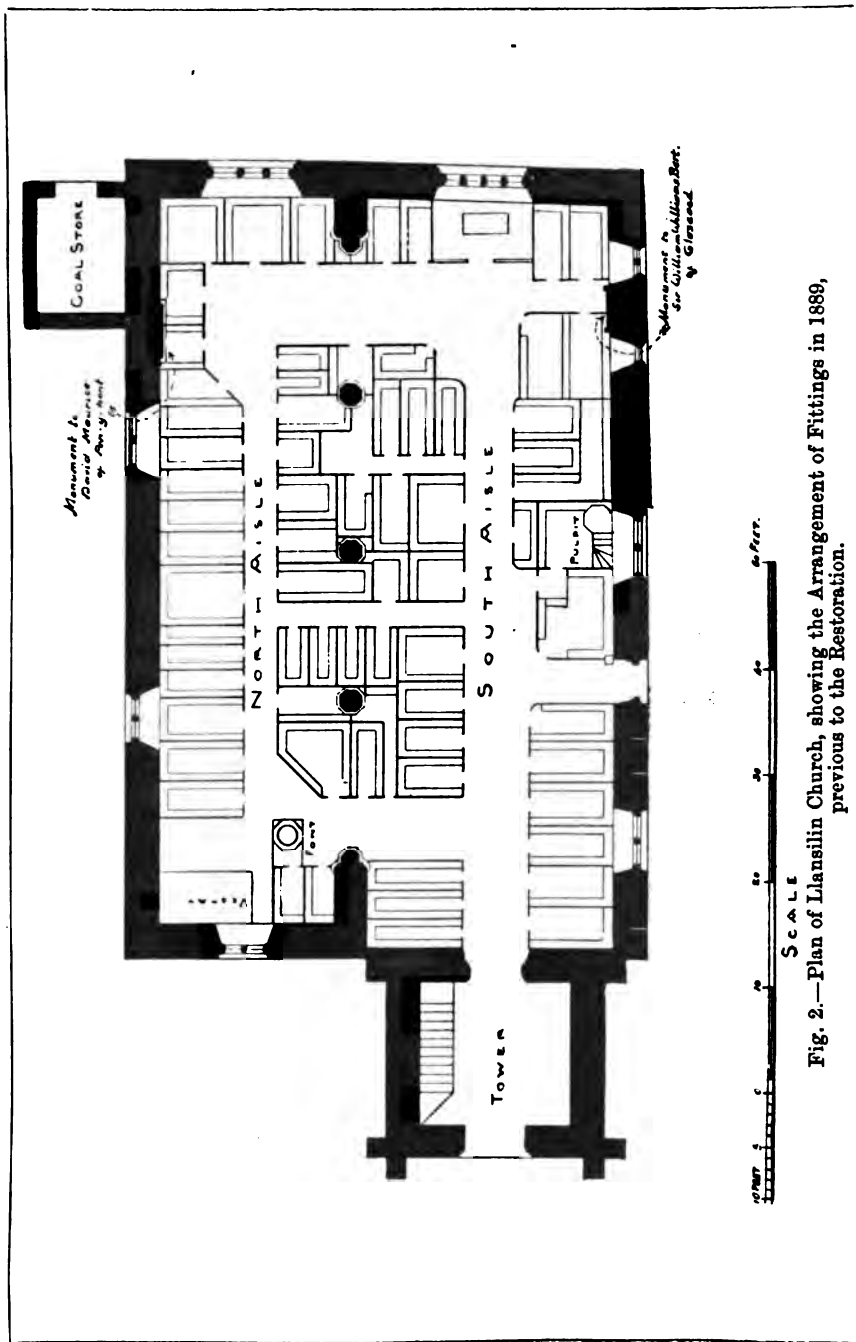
Plan of Llanstinon Church, showing the Arrangement of Fittings in 1889, previous to the Restoration.
